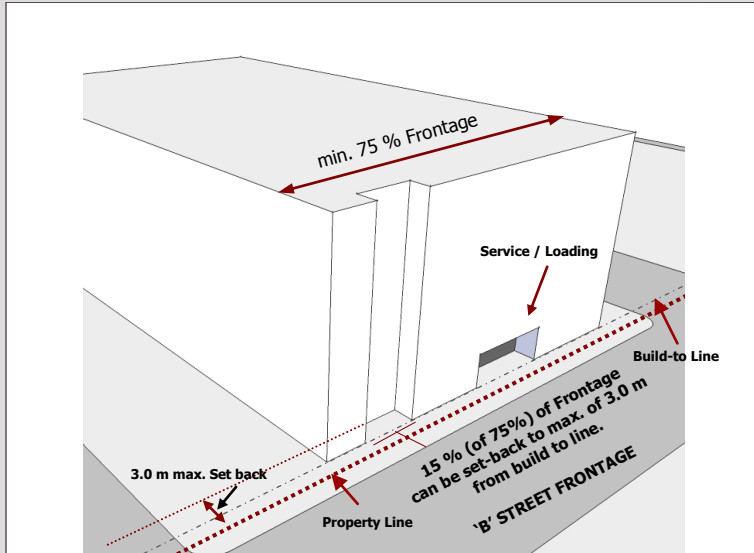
Illustration of a building streetwall positioned on a 'B' Street frontage.
